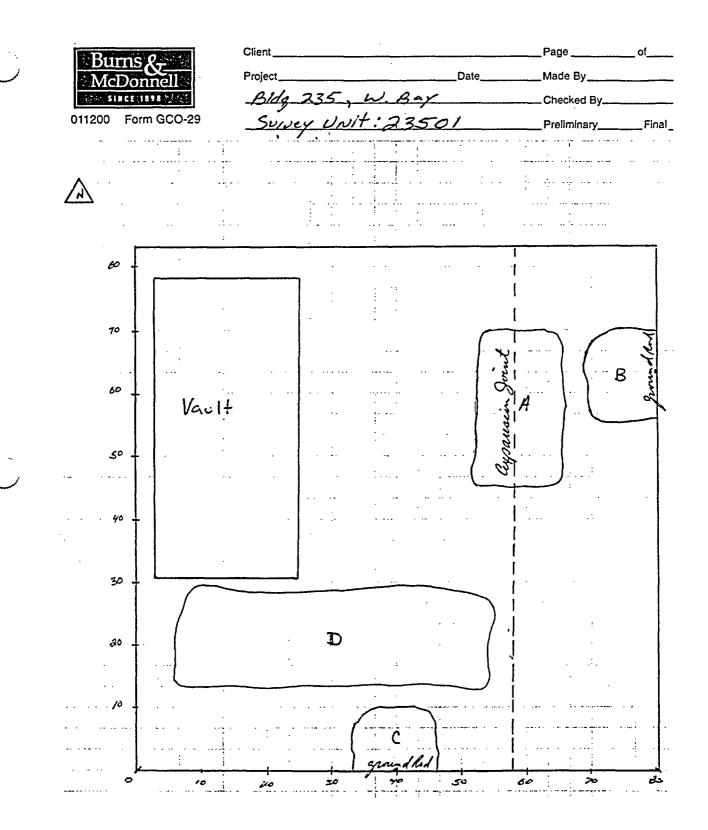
Building 235, Room 101 Expansion Joint Scans
